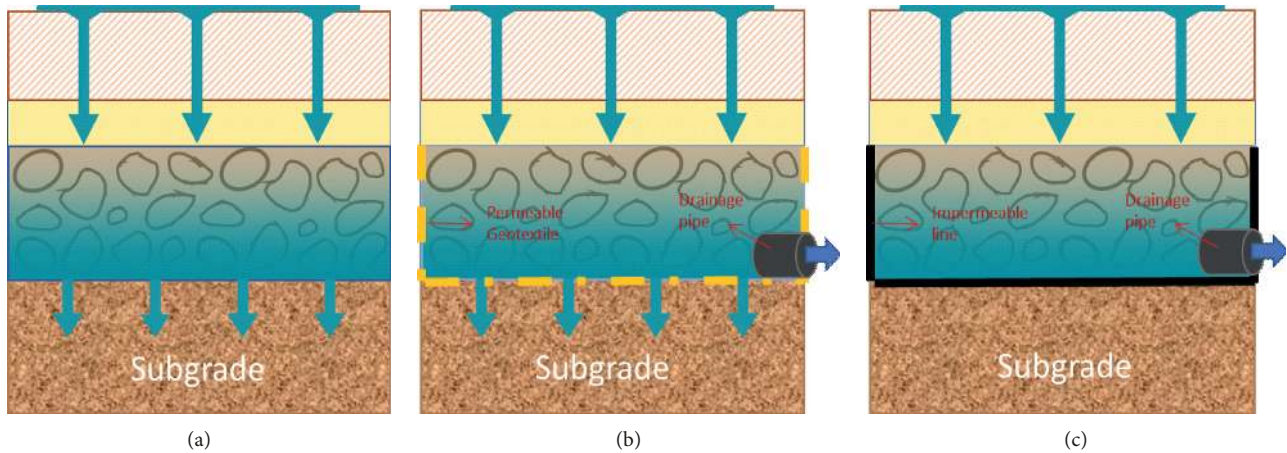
Typical permeable pavement sections (based on [99–101]): (a) fully permeable pavement, where water can infiltrate to subgrade; (b) half permeable pavement, with some water infiltrating to the subgrade, most is stored in the pavement structure; (c) permeable pavement with no water infiltrating to the subgrade but is stored in the pavement structures.
